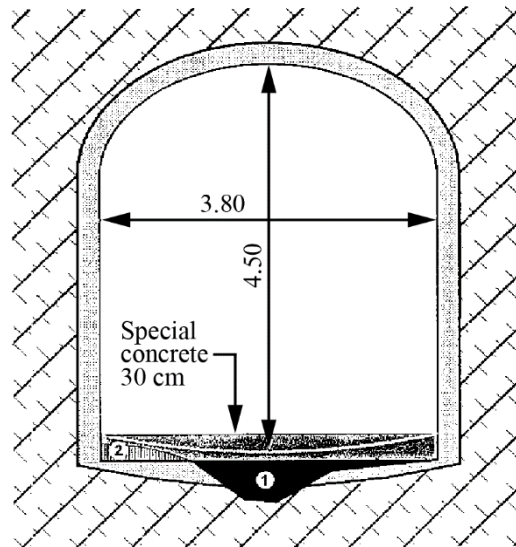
Cross section of the sediment bypass tunnel in Runcahez, ① casting of concrete to level out the underground ② removal of concrete, from Jacobs *et al.* (2001)
